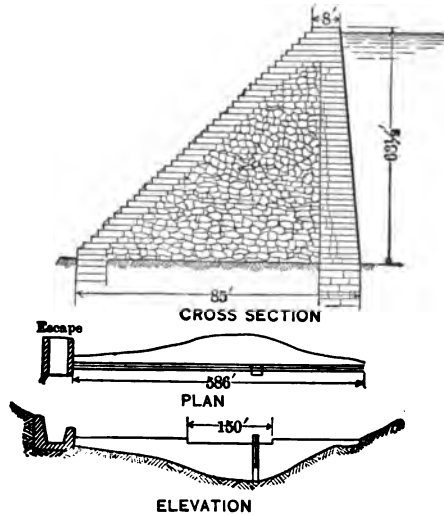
Elevation, Plan, and Cross-section of Castlewood Dam, Colorado.
